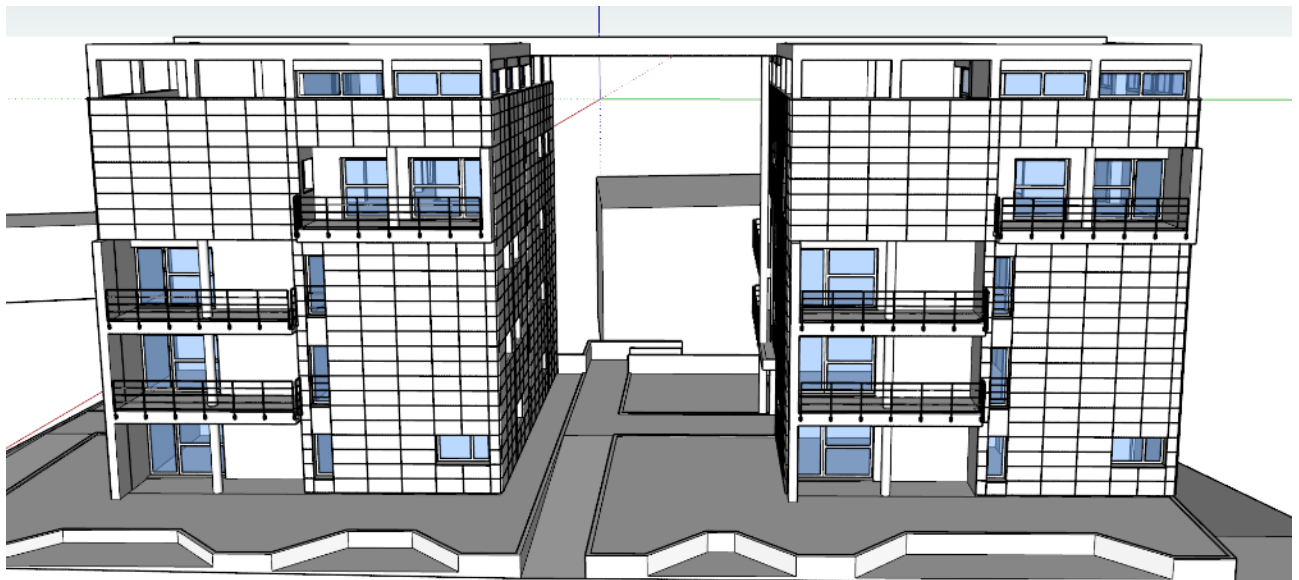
Demo-site 4, 3d drawing of the existing building
